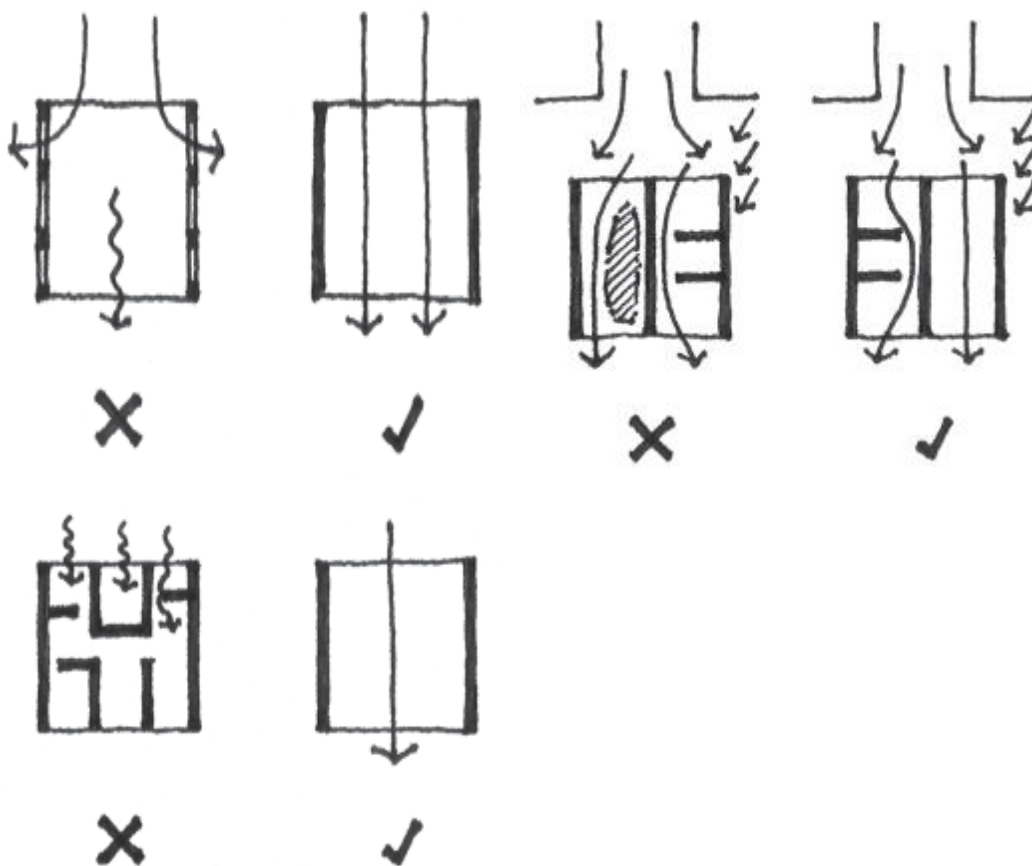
Examples of opening design to encourage interior air movement [34].
